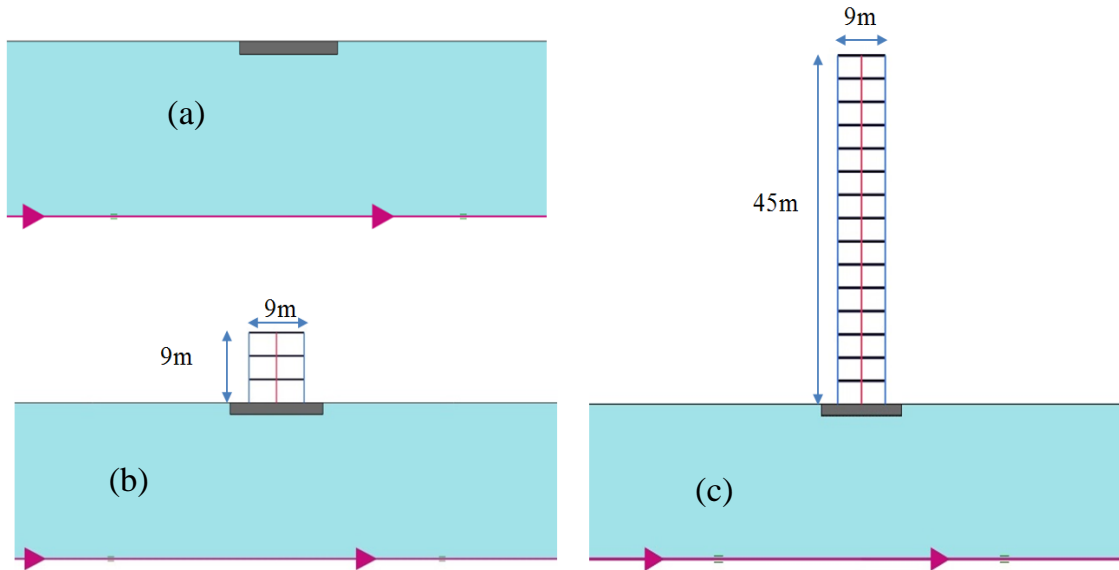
Different surface structures: a) only ta slab; b) 3-story building; c) 15-story building
